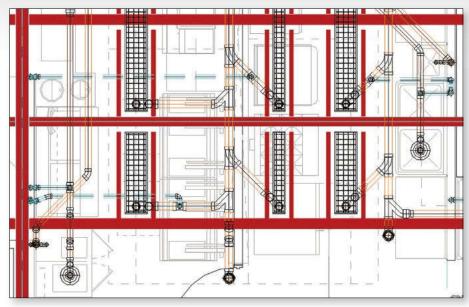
This project involved remodeling an existing building where the floor load doubled, requiring additional beams to be added with a spacing of 5 ft on center. Using structural plan views made it easy to coordinate drain and floor penetrations for the restaurant areas above.
